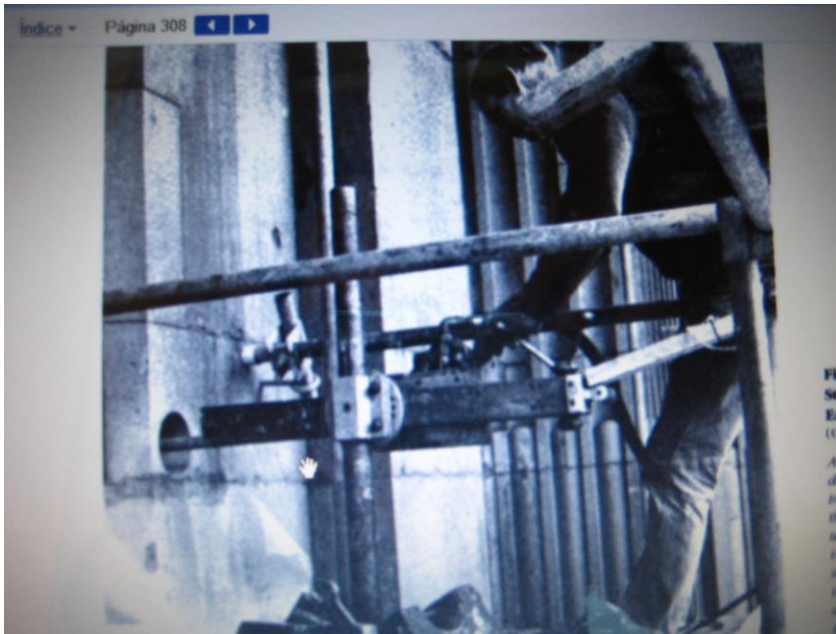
Enlarged foundations, central tower, York Minster, England
